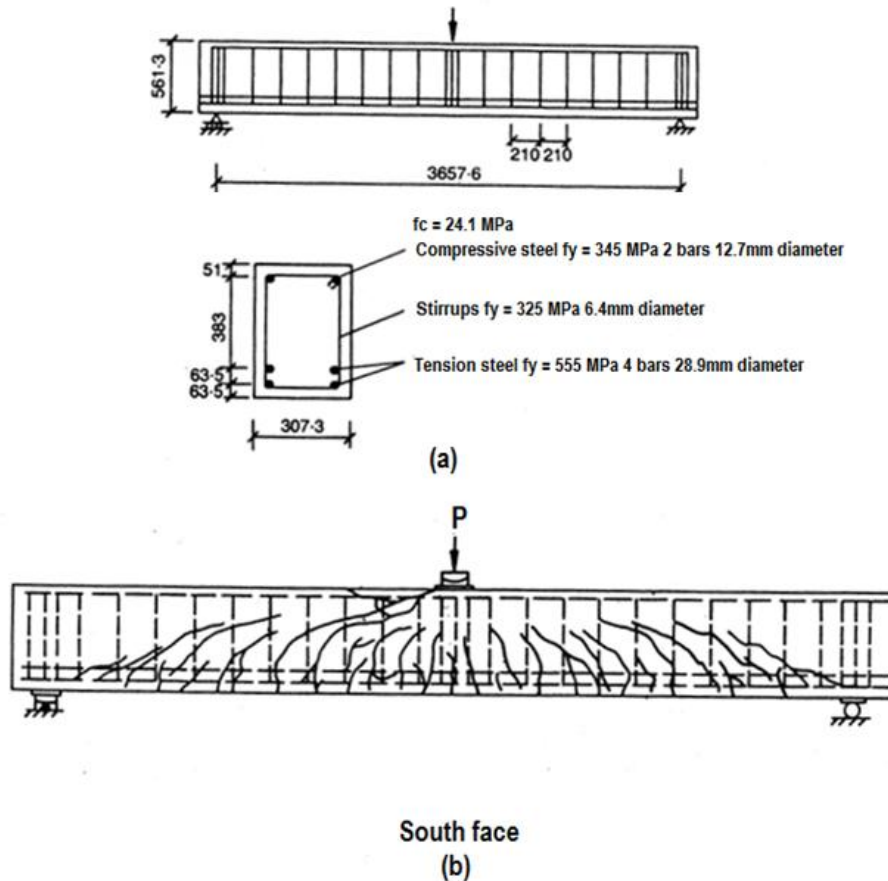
RC BEAM WITH STIRRUPS UNDER CENTRAL POINT LOAD. (A) MEMBER'S CHARACTERISTICS AND (B) EXPERIMENTALLY OBSERVED CRACK PATTERN AT ULTIMATE LOAD^[186].
